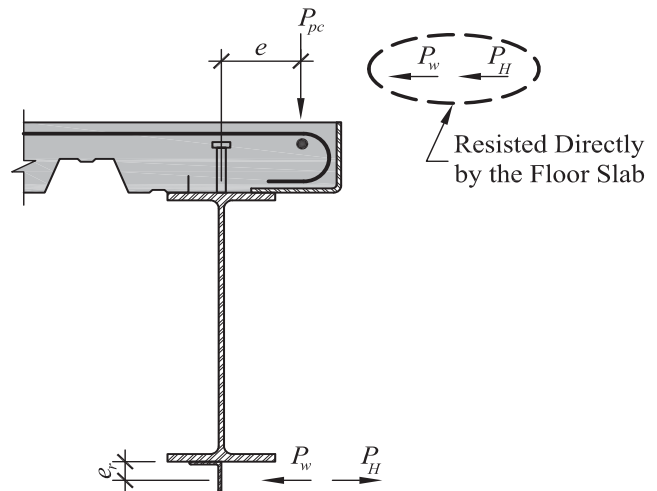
Vertical and lateral forces on spandrel beam.
